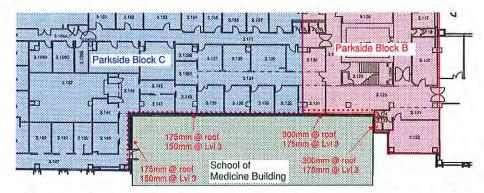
Seismic gap requirements between Parkside B&C and School of Medicine Building [31]
